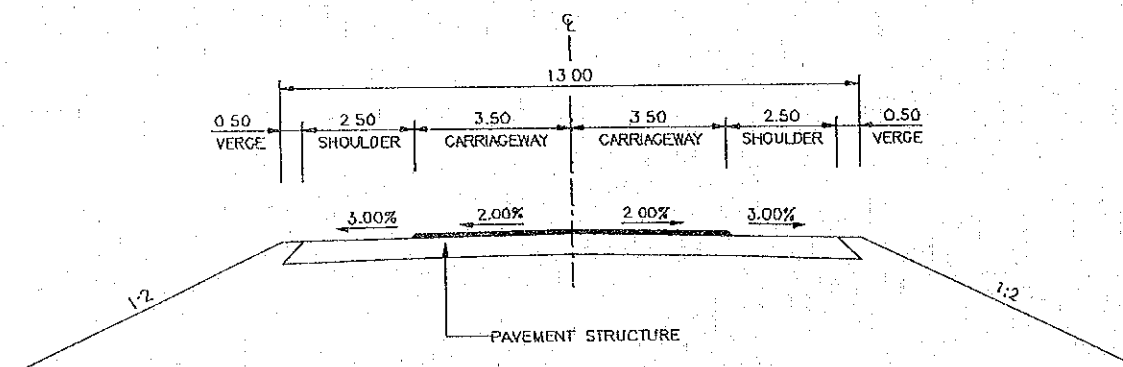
Typical Cross-section of the Connecting Road on the Lao PDR
